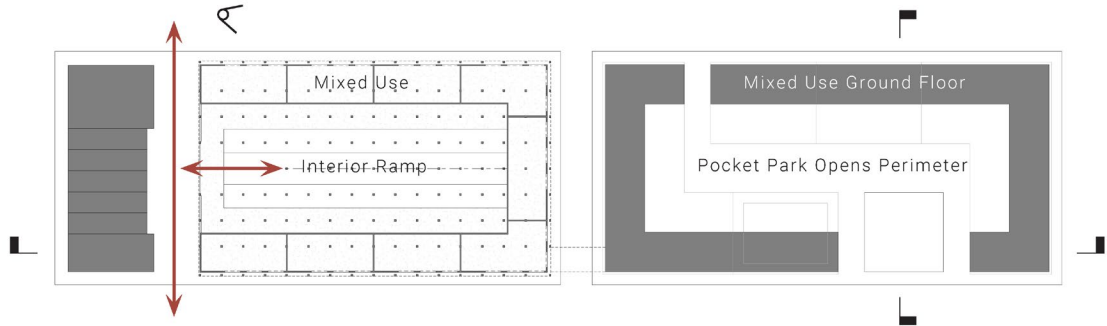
, Perimeter Block - Enlarged Plan - Ground Level (Source: Drawn by Author)
